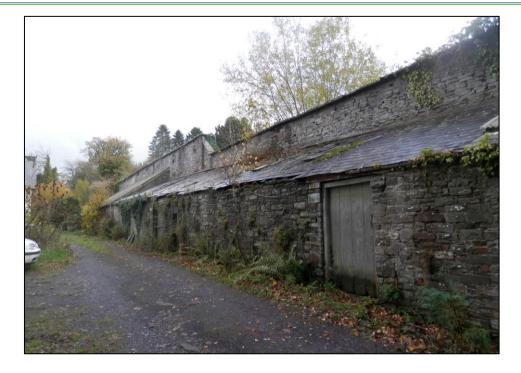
View looking E at the enclosing walls of Walled Garden at Ffrwdgrech
